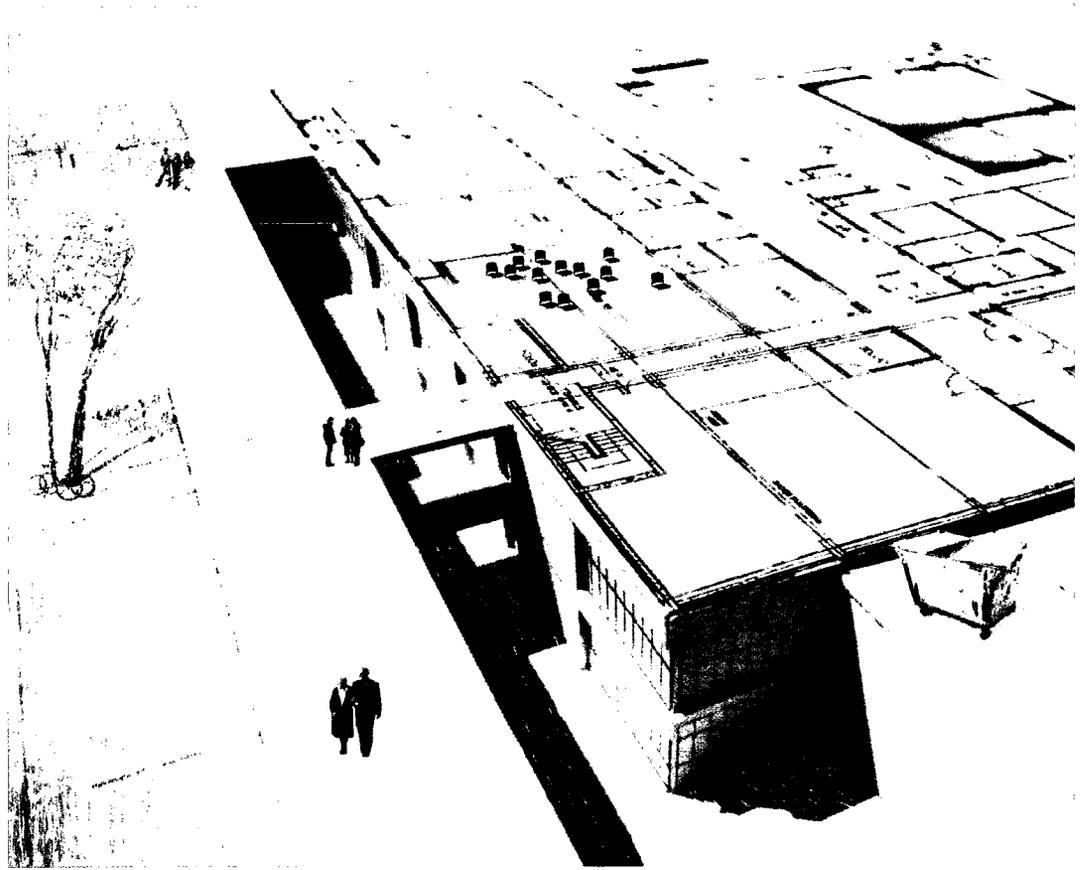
View along the pedestrian path when approaching from Campus Avenue. Building 22 ground floor / Level 2 plan and new subterranean facade (right); 'canyon' (foreground).
